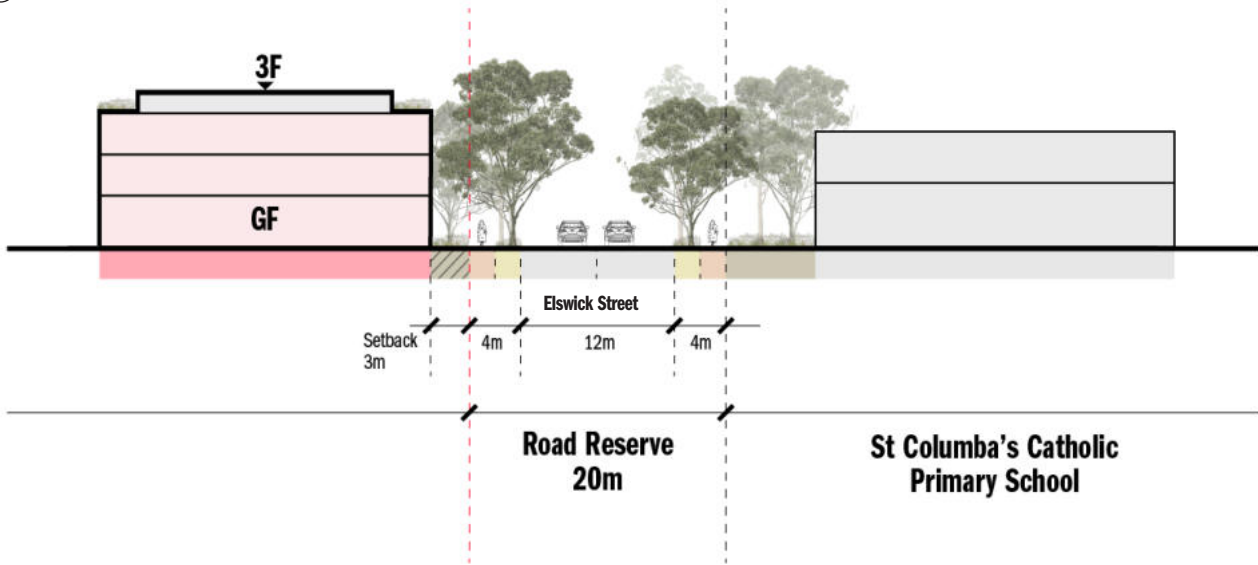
Section 1 - cross section of a three storey residential building on Elswick Street opposite St Columba's
